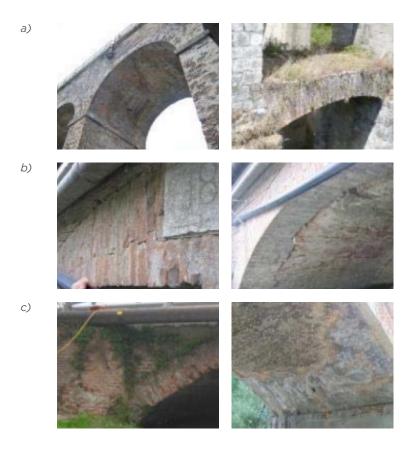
Typical defects of masonry arch bridges, from (Zampieri, 2014) a) Degradation and loss of bricks, loss of mortar joints and salt efflorescence; b) longitudinal cracking; c) penetration by vegetation, fractures in piers and wing walls
